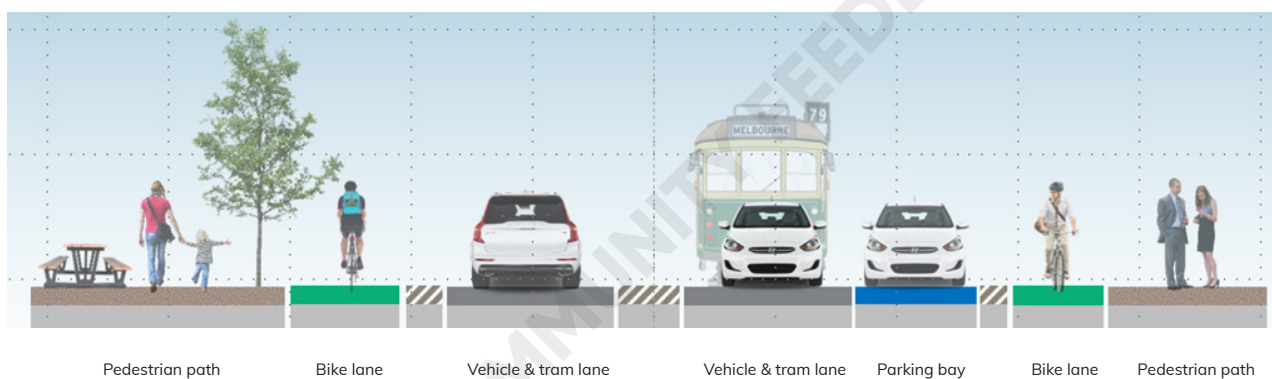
Church Street (mid block) - Proposed future (indicative only)
